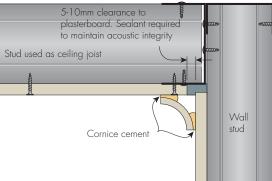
Non-Trafficable Ceiling to Plasterboard Wall
